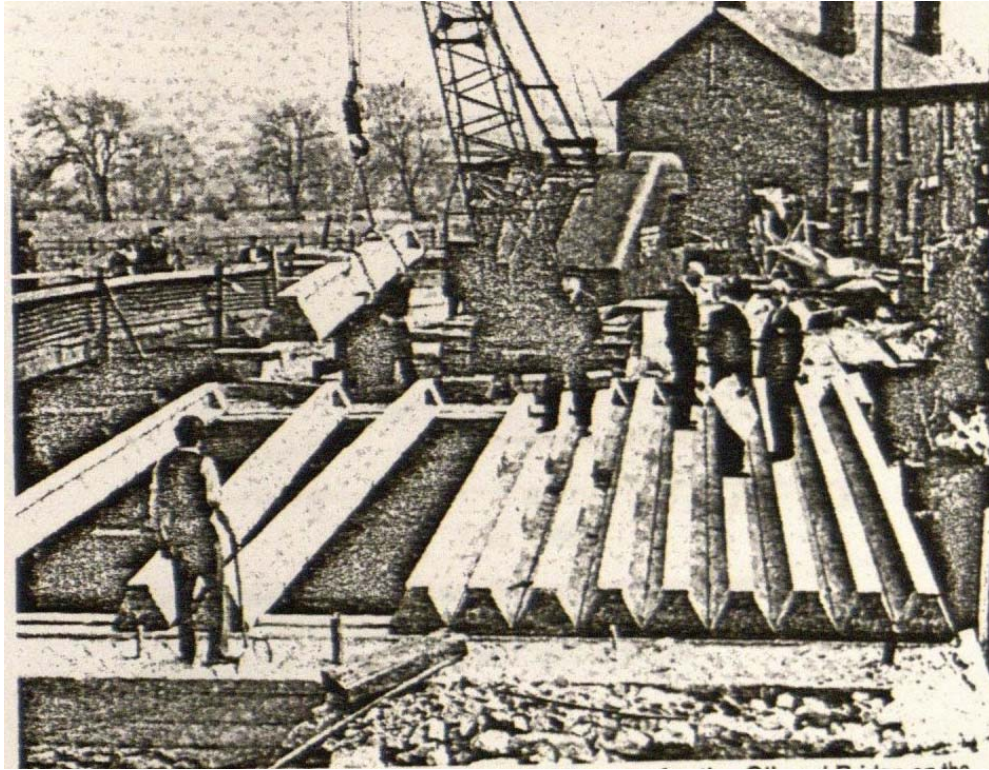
Erecting partially prestressed inverted T Beams for Gilyord Bridge on the Manchester-Sheffield Railroad line in 1949. Dr. Paul Ableles is on the right. (Bennett 1984)
